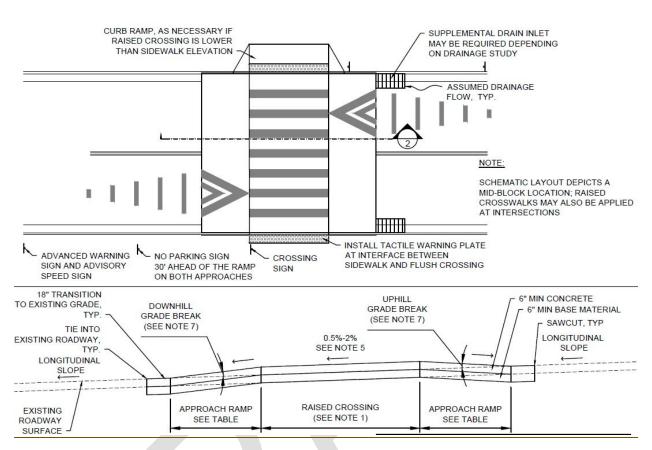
Typical Layout of Raised Crossing at Mid-Block Location
